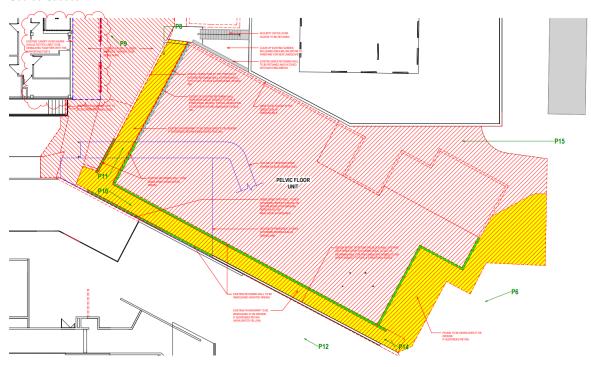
Burt Nelsen Wing Demolition Plan Sheet 3
